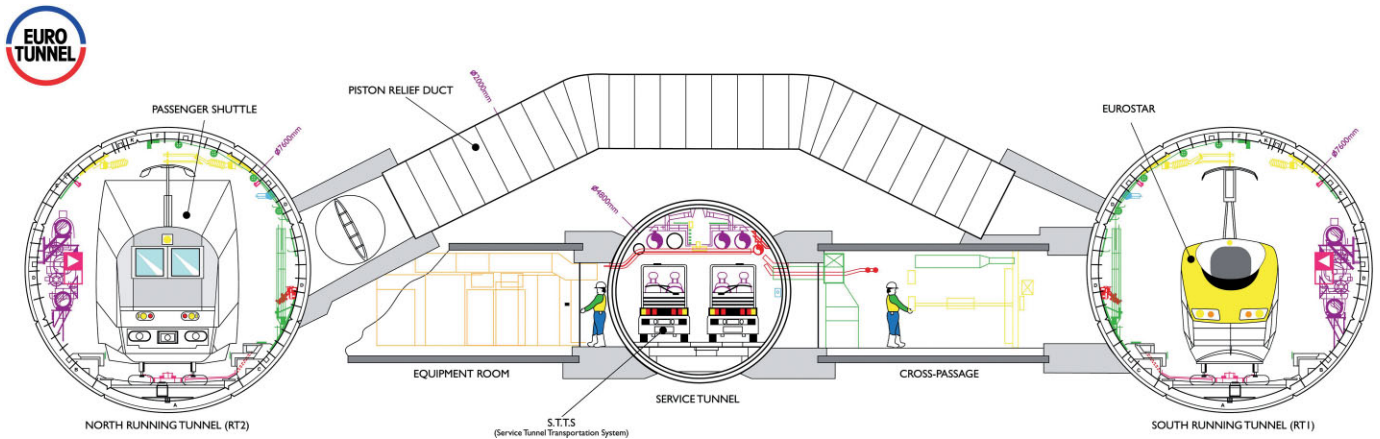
Tunnel system of the Channel Tunnel (France/UK) with central service tunnel and cross passages (every 375 m) and pressure balancing connections (source: Eurotunnel)
